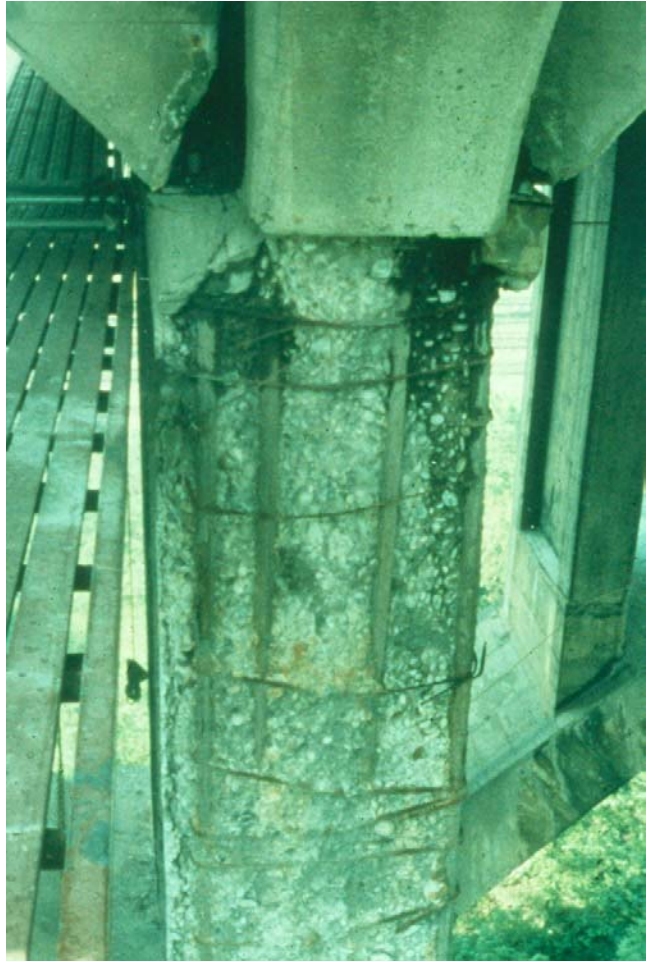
Severe Scaling and Spalling on a Spandrel Column
